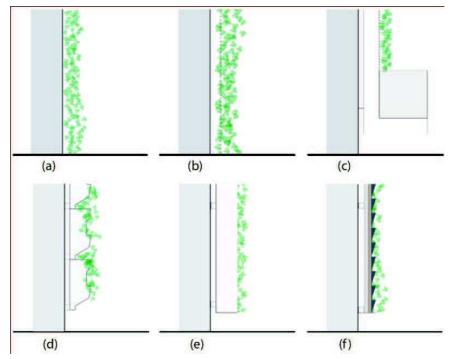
Vertical greening systems: a – direct greening system, b – indirect greening system combined with planter boxes, d – LWS based on planter boxes, e – LWS based on feat layers [6]
